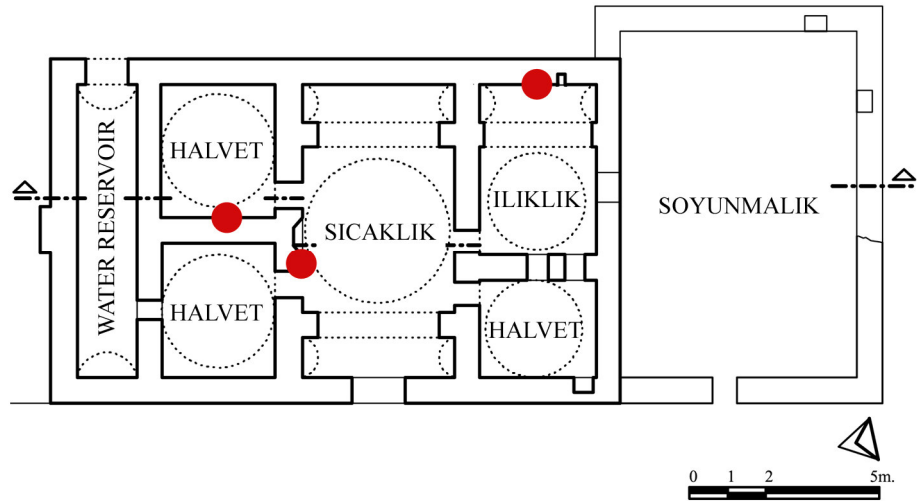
Plan of Kamanlı Bath showing where the samples were collected
